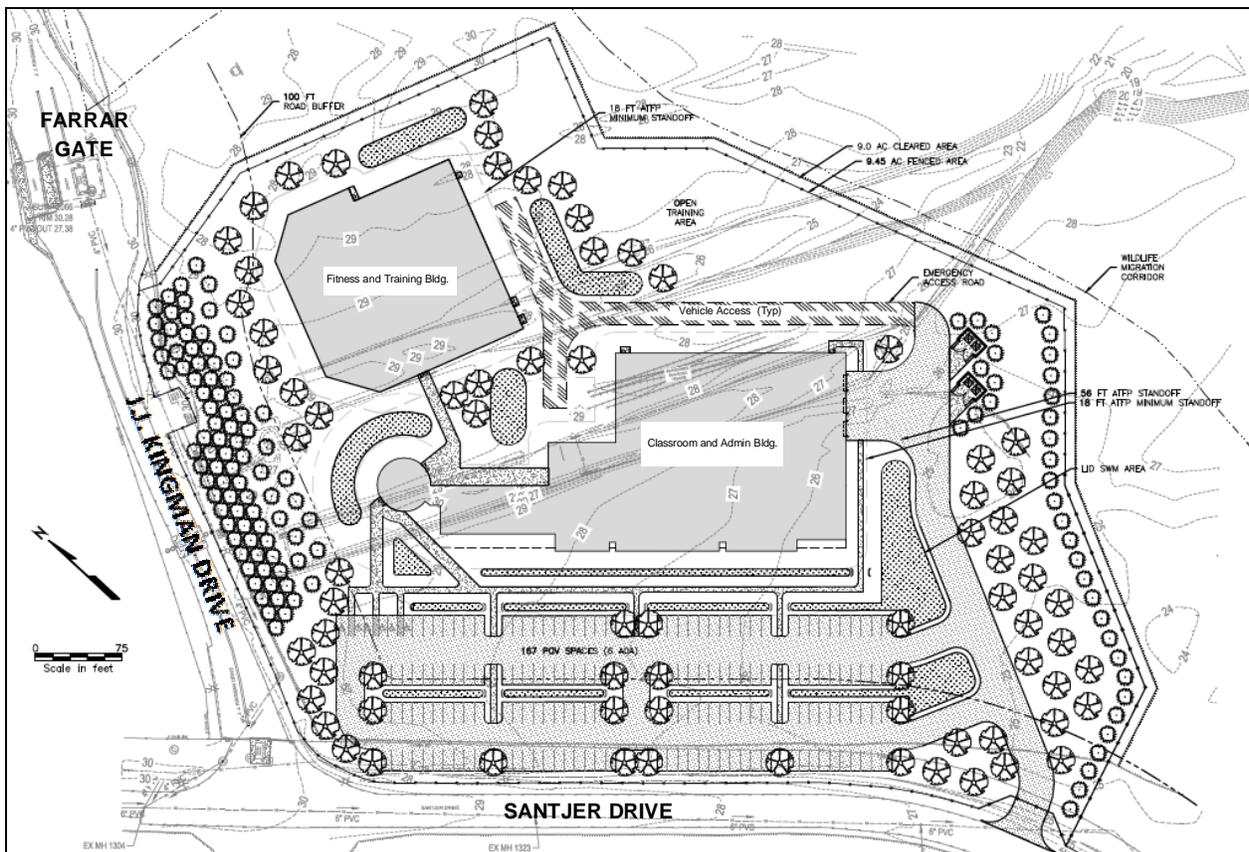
Concept Site Plan, Proposed STF; DAAF, Fort Belvoir
